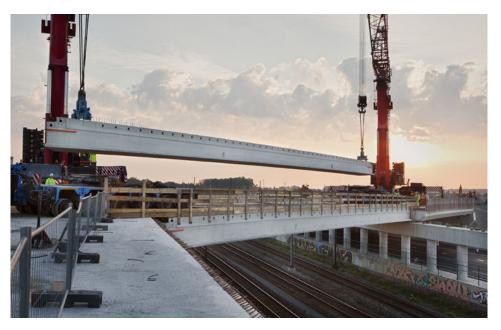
Erection of prefabricated bridge girders in A9 Badhoevedorp [Spanbeton, nd]
